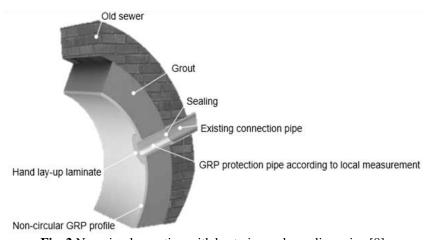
Non-circular section with host pipe and new liner pipe [8]
